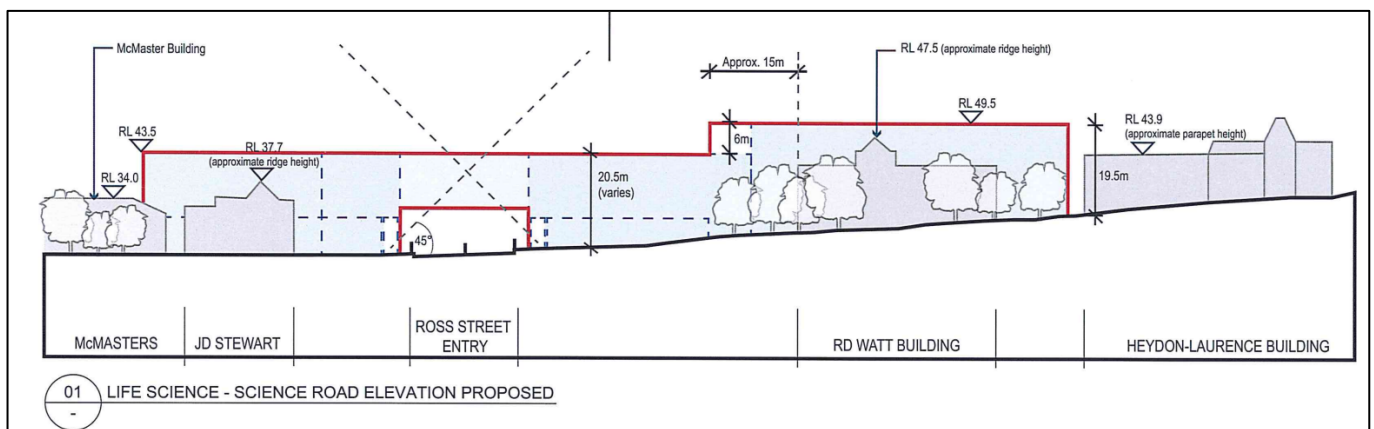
| CIP – Approved Life Science building envelope – Science Road elevation (Source: SSD-6123)
